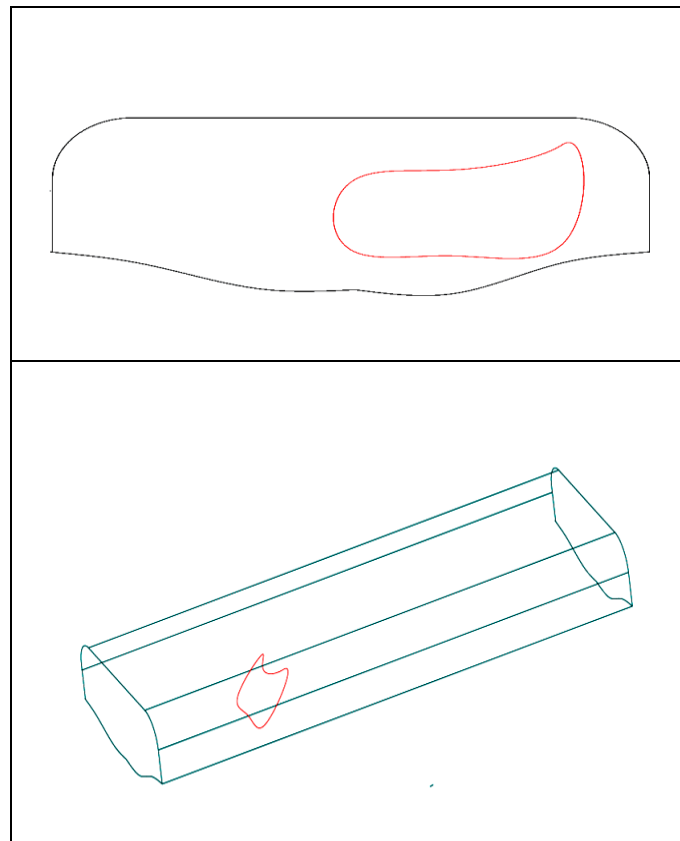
Front and 3-D view of the rail head with the 23% H.A. reduction internal flaw
